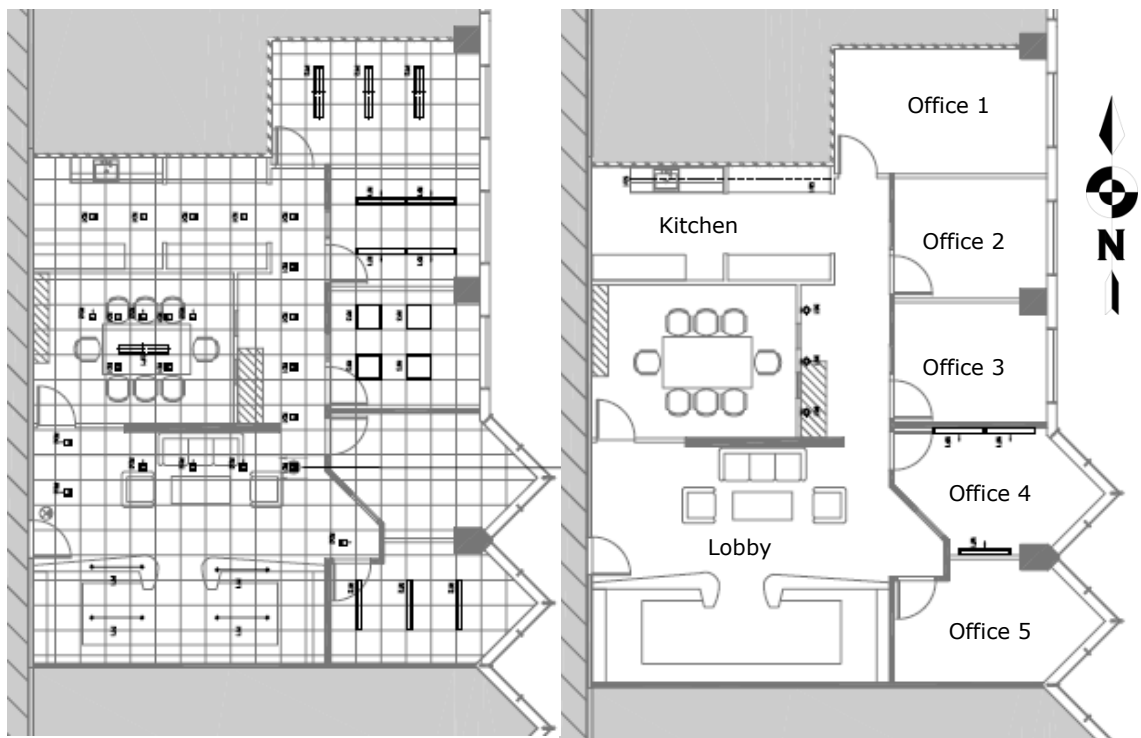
REFLECTED CEILING PLAN AND REFLECTED FLOOR PLAN FOR THE OFFICE SPACE
